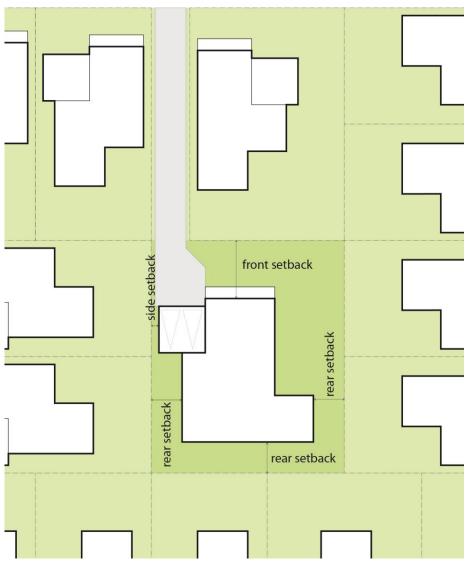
Battle-axe lot (without any street frontage) example of setbacks
